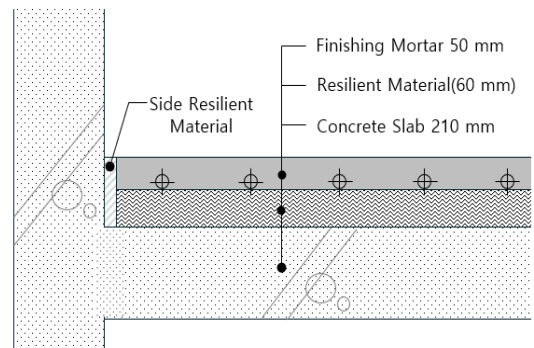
Cross-sectional view of the floor structure at the measurement site
